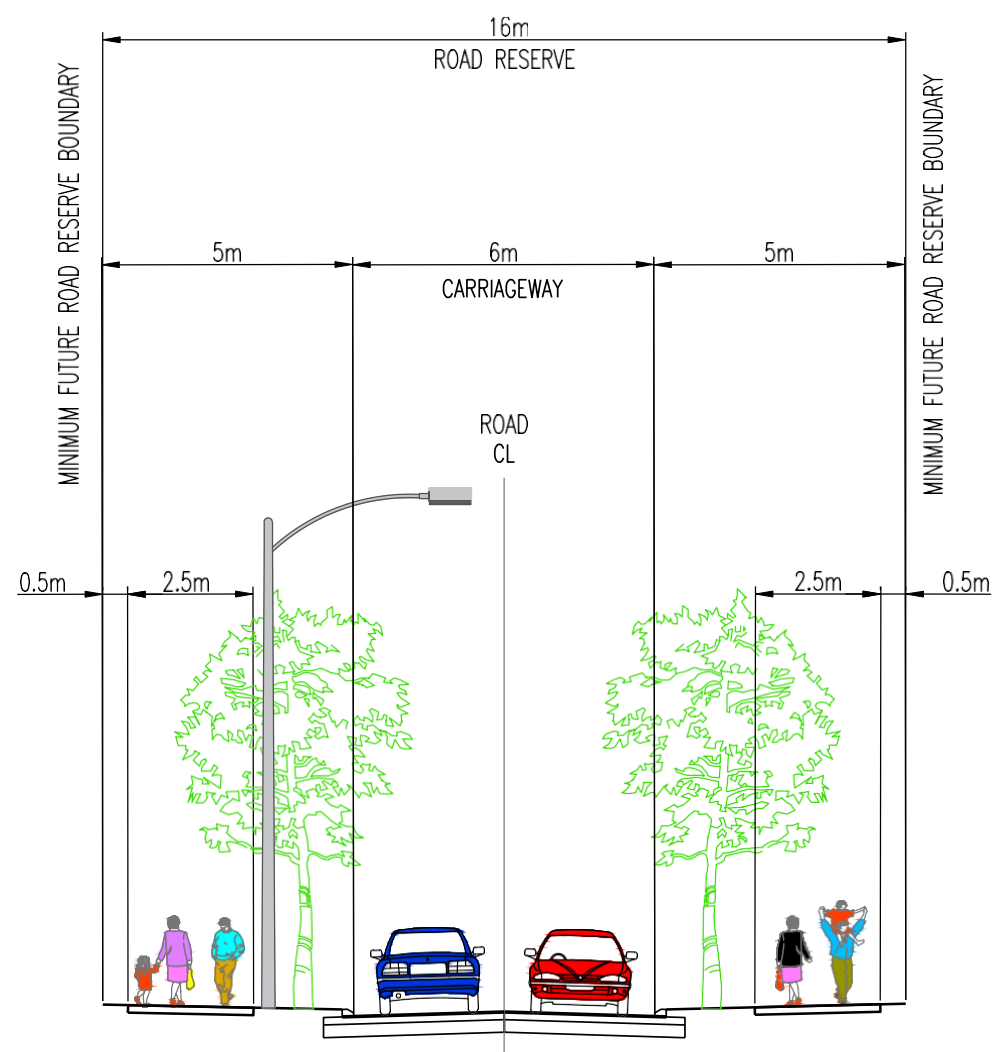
CROSS SECTION OF ACCESS STREETS D
